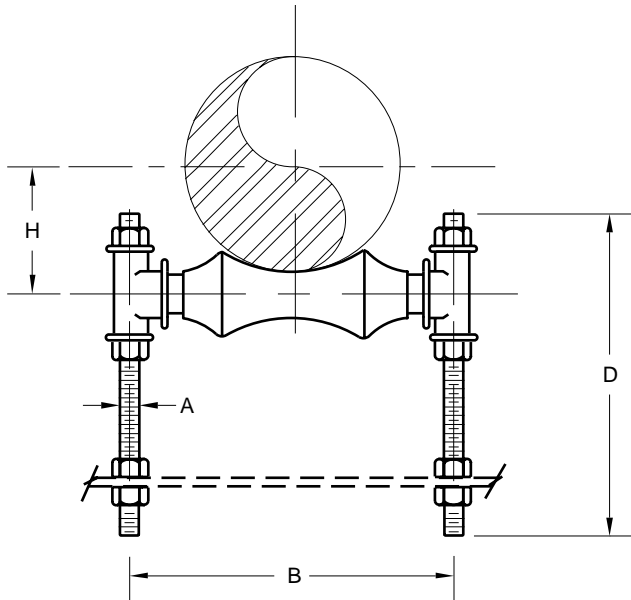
ADJUSTABLE ROLL SUPPORT
